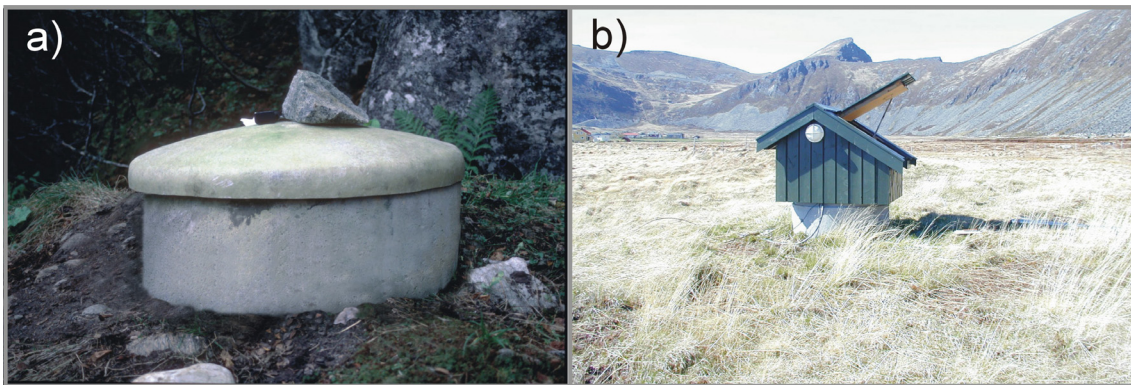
a) Fibre glass cover sloping outwards on top of the concrete well-protection to ensure that the manhole cover is watertight. b) Well-cover on top of a concrete well-protection.
